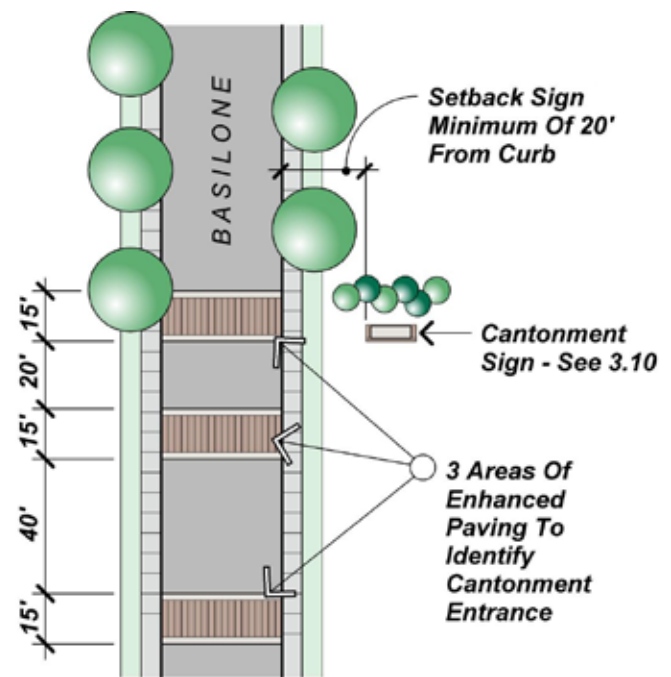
Plan view of typical safety zone. For cantonment sign detail see Figure 3.10-10.
